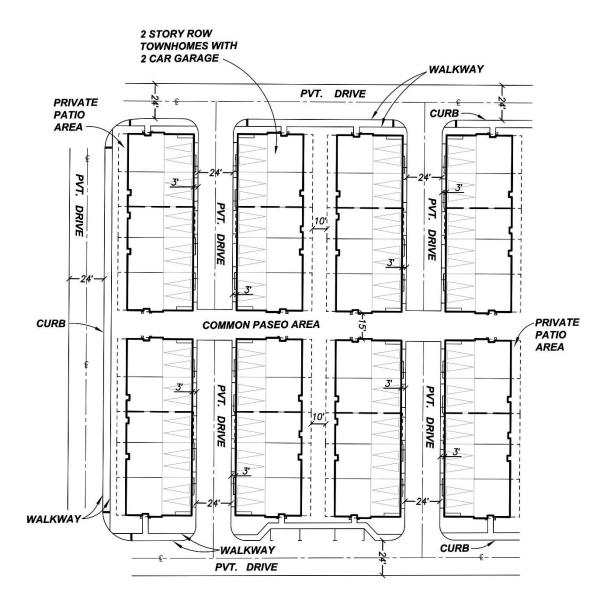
Typical Two-Story Townhome Plotting
